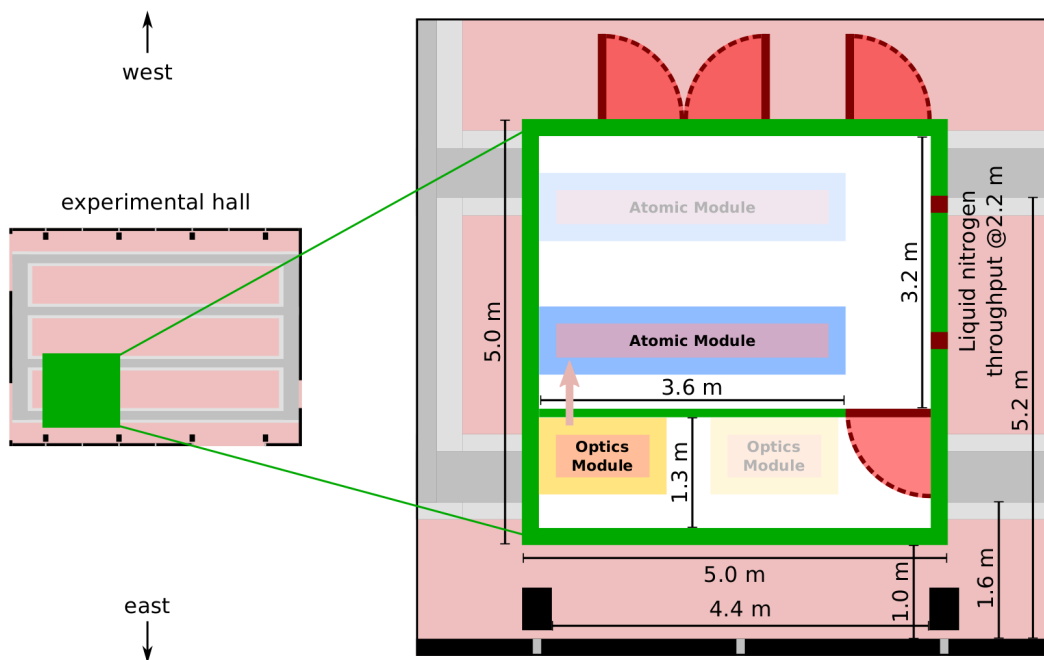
Ground plan of the laboratory container. The location inside the experimental hall has been chosen such as to minimize the exposure by the sun through the east and west window fronts. Electrical power, cooling water and compressed air are provided through cable ducts in the hall and openings in the floor of the container. Liquid nitrogen can be stored outside and fed through the wall. The more sensitive laser system is in an extra room with additional air conditioning to reduce disturbances by routine maintenance in the future.
